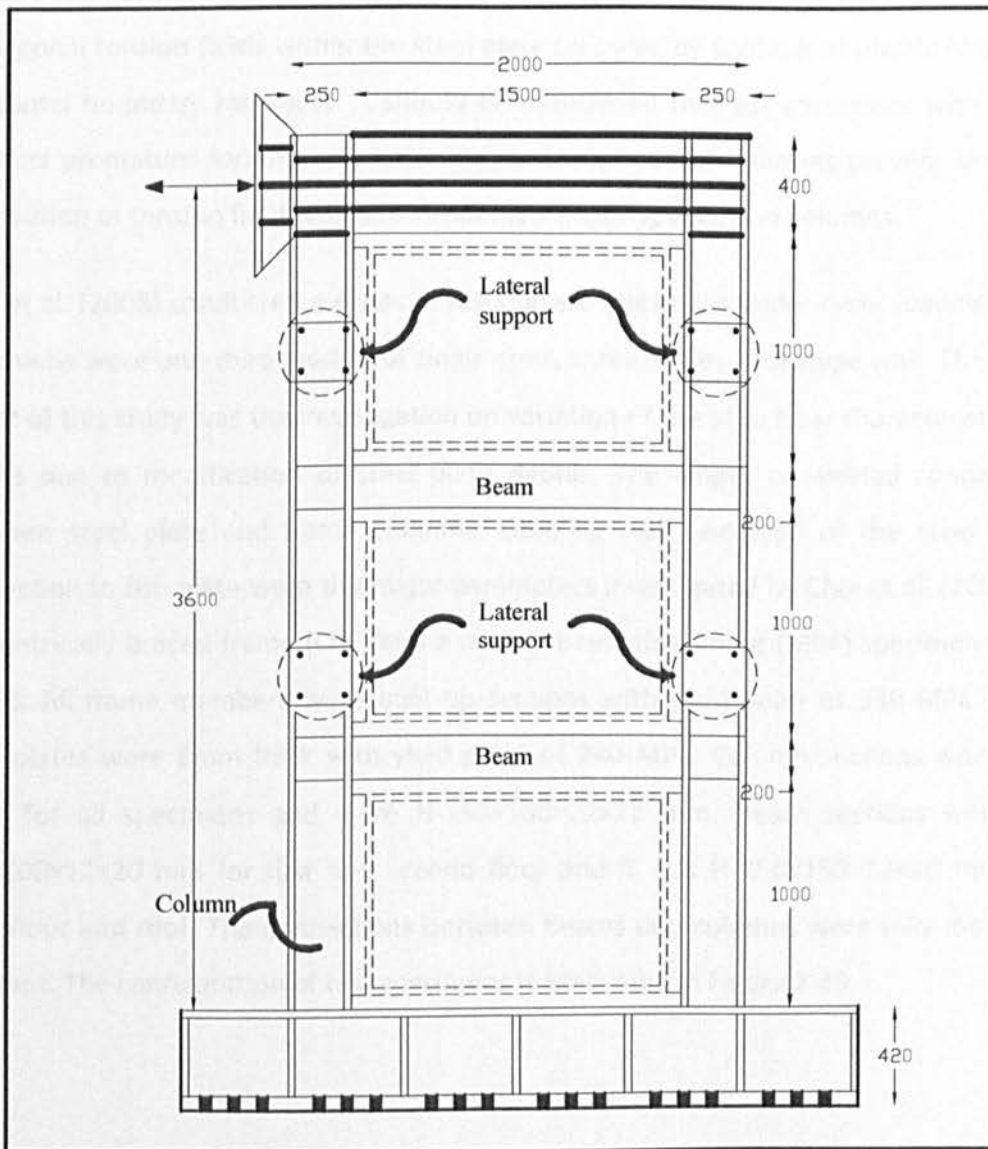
Scheme of test specimens (Park et al., 2007)
